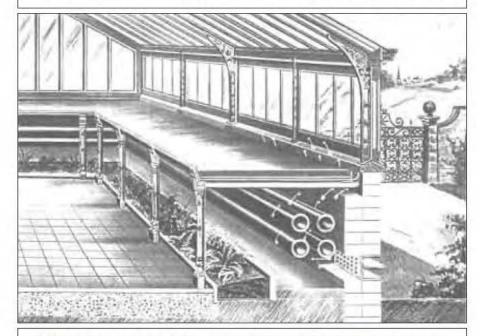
Section Through Span Greenhouse. Design for End Glasshouses At Benarth Hall. Source Fosters & Pearson 1909 Sales Catalogue (Page 41)
